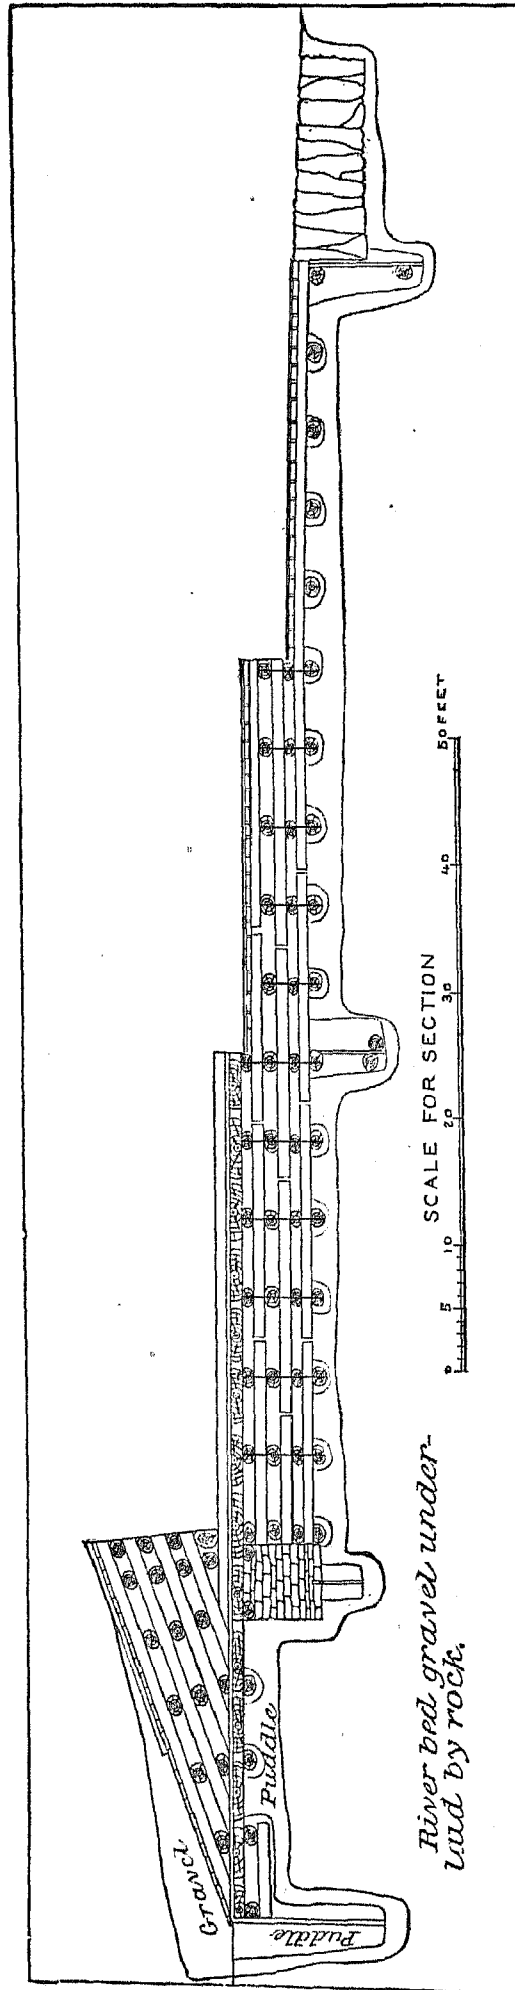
Cross-section of Hoosac Tunnel Dam.
